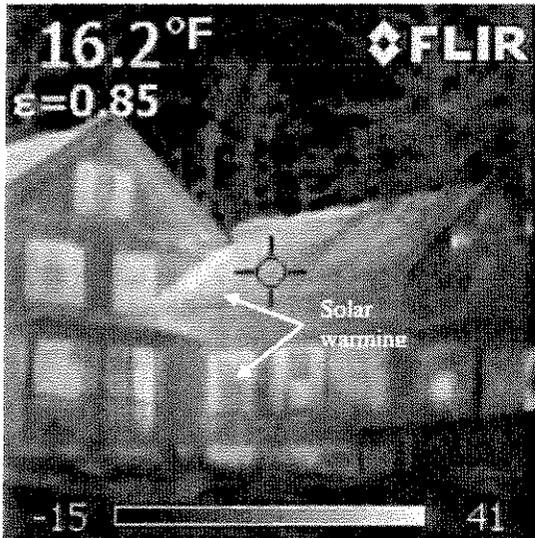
Grant House- Front: Heat leaks at building connections. Note black roofs and shutters are bright from solar warming on the east side of the house
